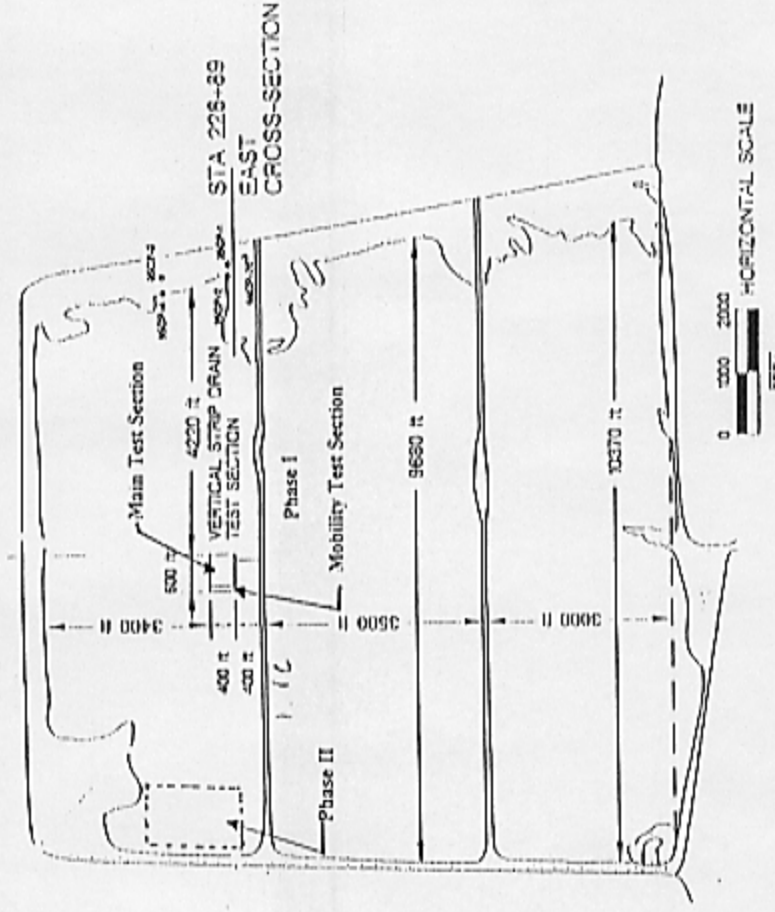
Plan View of Cranev Island and Location of Vertical Strip Drain Test Section
